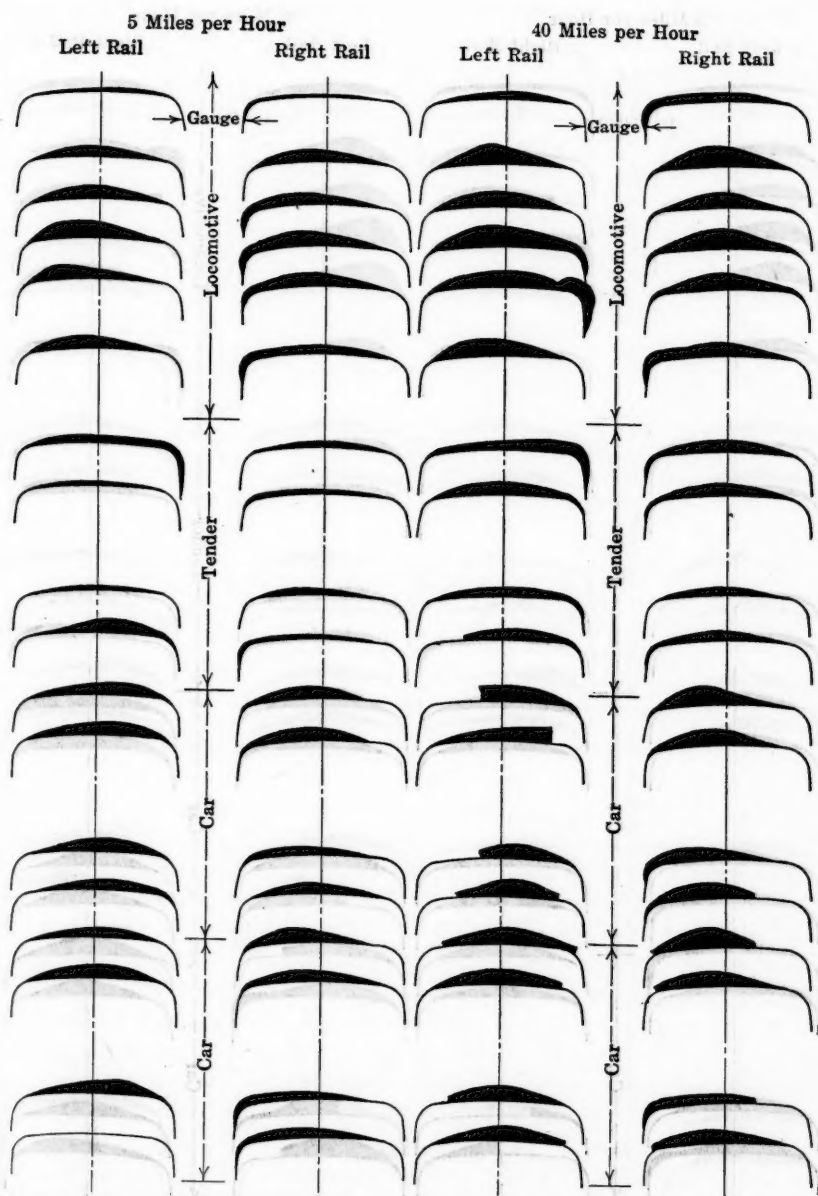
BEARING OF WHEEL ON RAIL. STRAIGHT TRACK. FLAT TIE-PLATES. MIKADO TYPE LOCOMOTIVE AND CARS. READING COMPANY.
